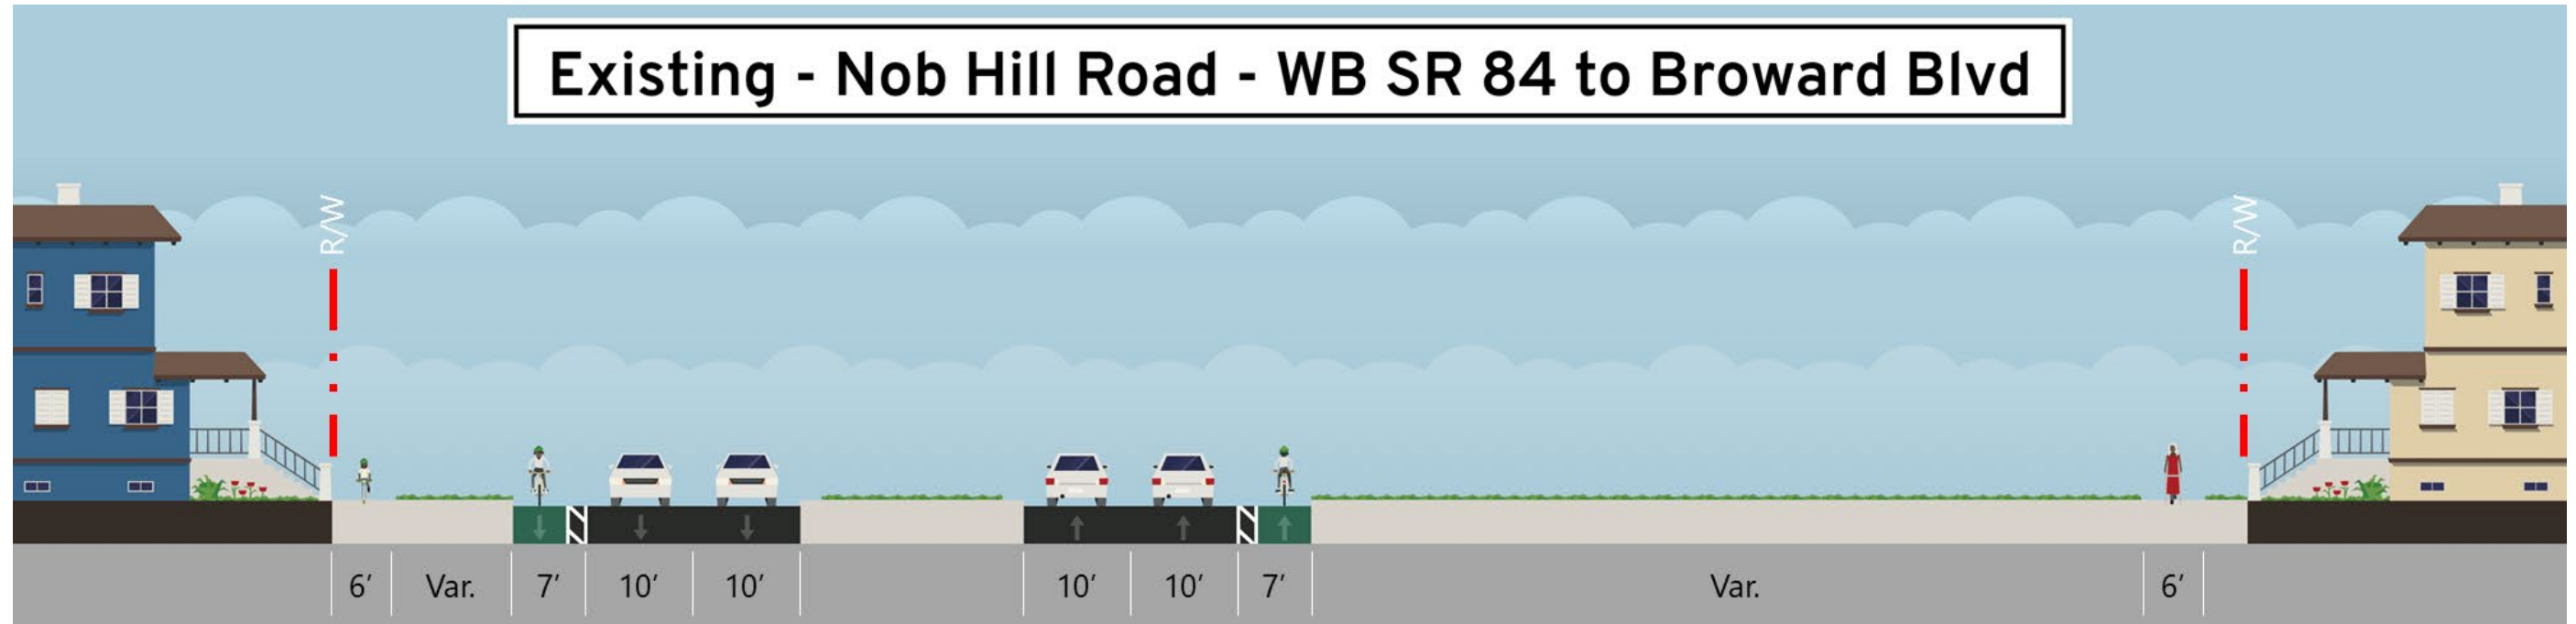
depicts the existing conditions typical section for Nob Hill Road north of SR 84. No changes are recommended for this section of Nob Hill Road, since adequate roadway, pedestrian, and bicycle facilities are provided.
